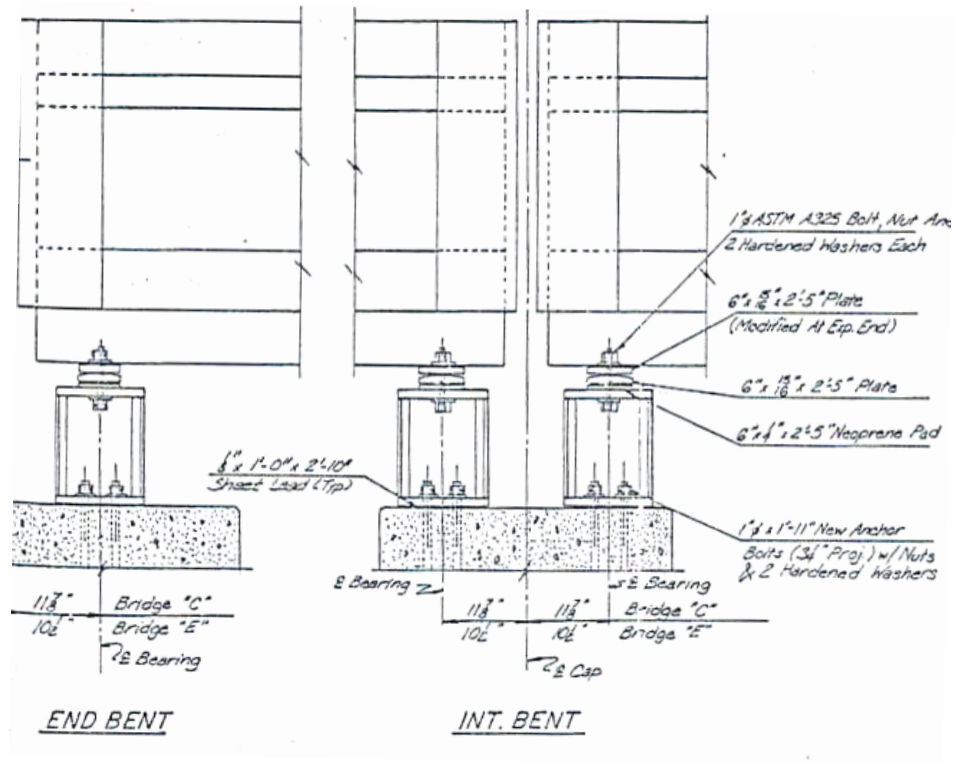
Pedestal bearing assembly of a 4-span prestressed concrete bridge (Mississippi State Highway Department)
